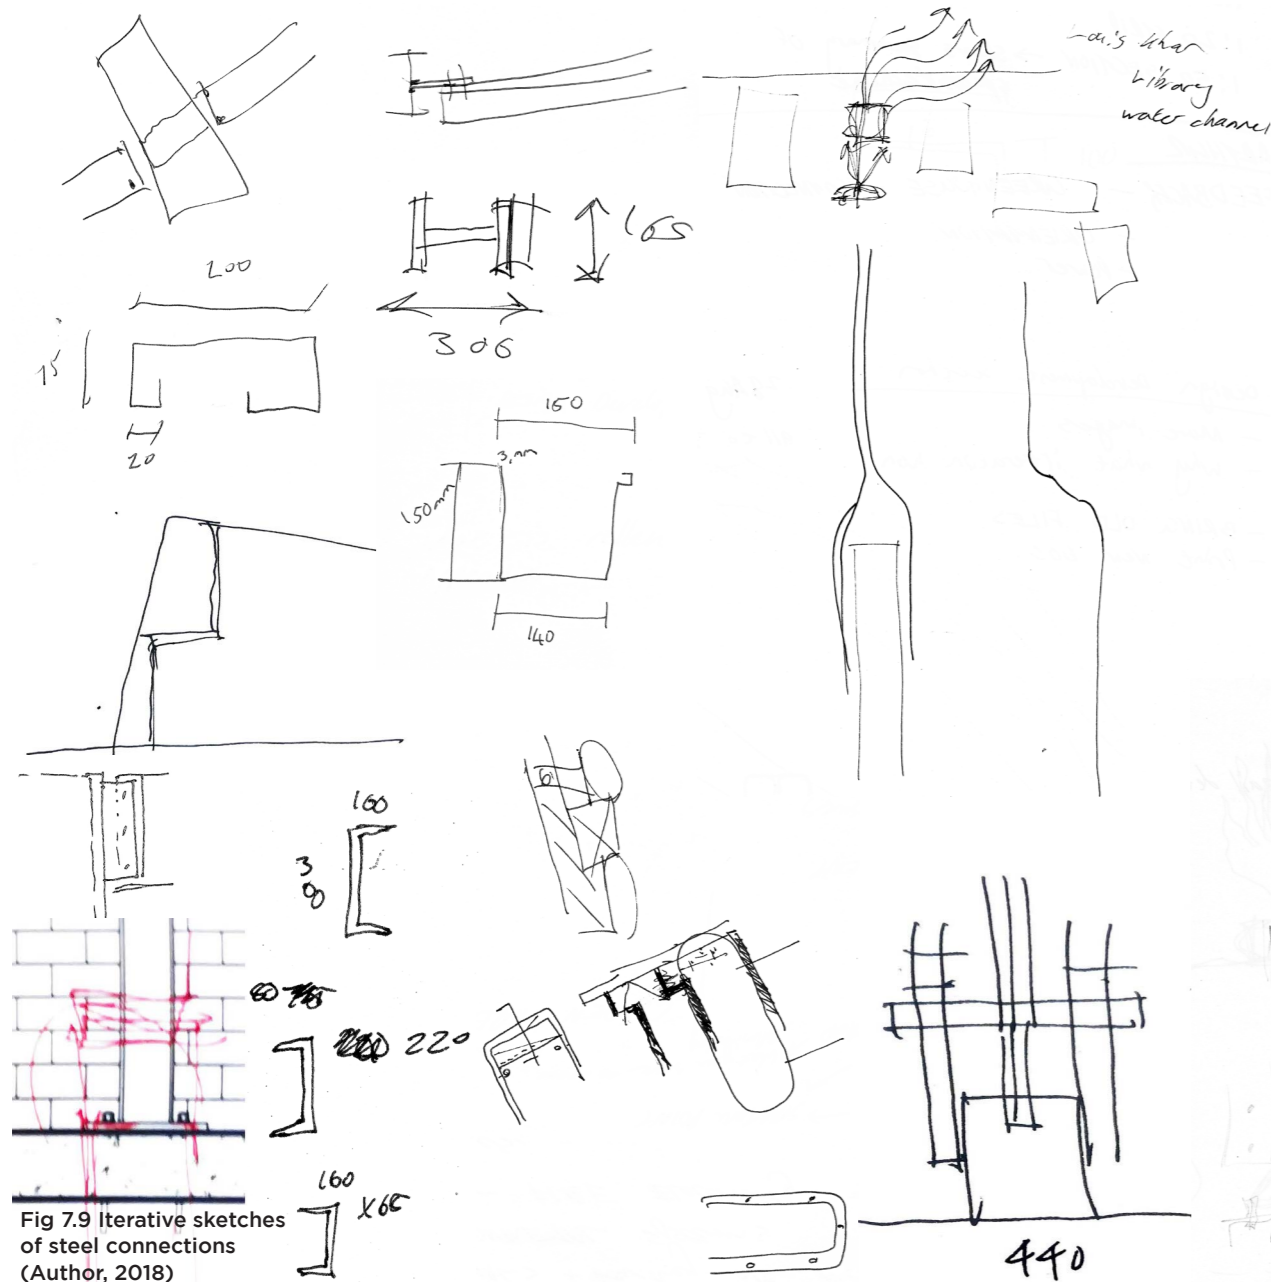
Iterative sketches of steel connections (Author, 2018)
